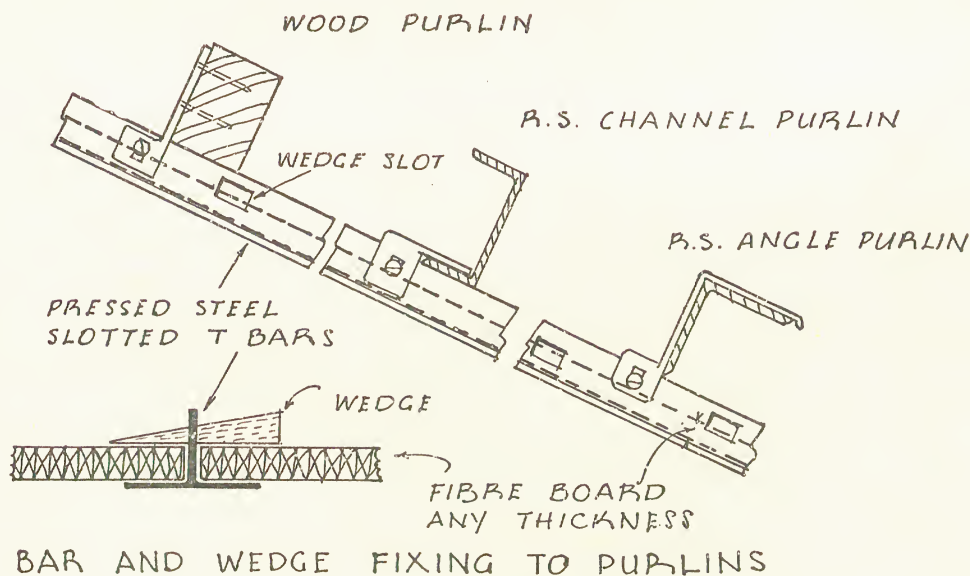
A patent method of fixing fibre board to ceilings and walls. The sheets are secured to sheradised pressed-steel slotted T bars with wedges. (Courtesy of F. C. Anderson & Sons, Ltd.)
